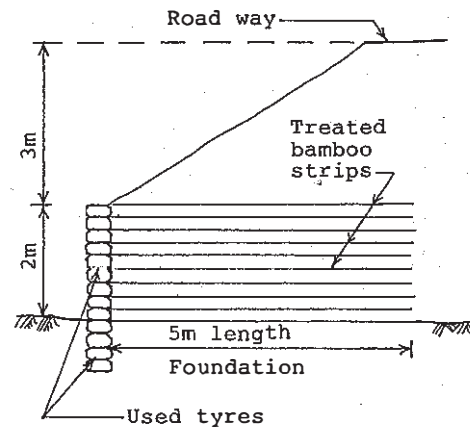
Reinforced earth retaining wall between 19/6 & 19/8 R-W Road
